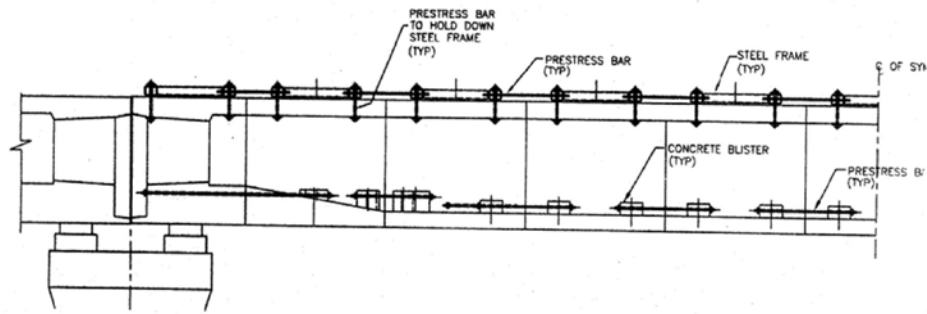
Longitudinal Section Showing Arrangement of Temporary Prestressing
